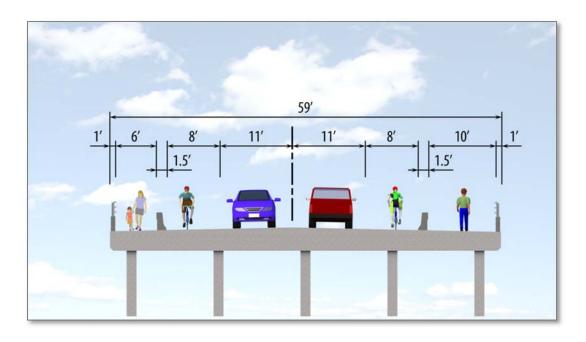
BUILD ALTERNATIVE 2 - BRIDGE TYPICAL SECTION
